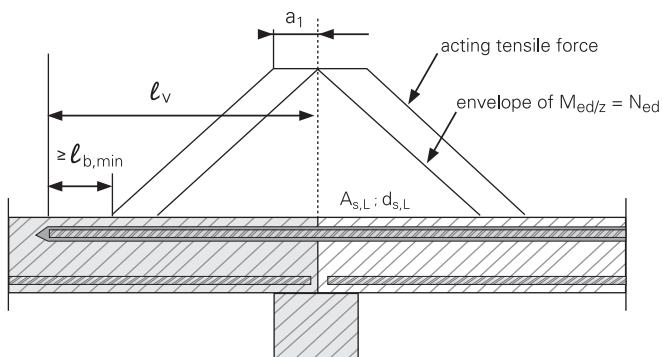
Anchoring of reinforcement to cover the line of acting tensile force.
